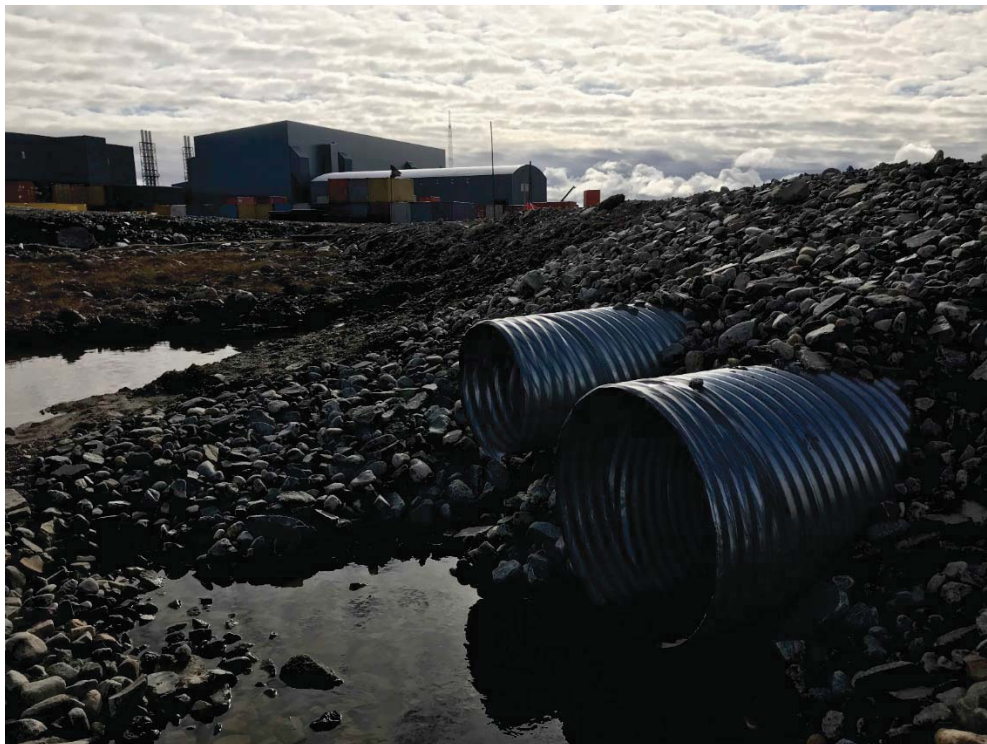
Main Camp Water Intake, Access Road, Looking Southeast (11 September 2018)
